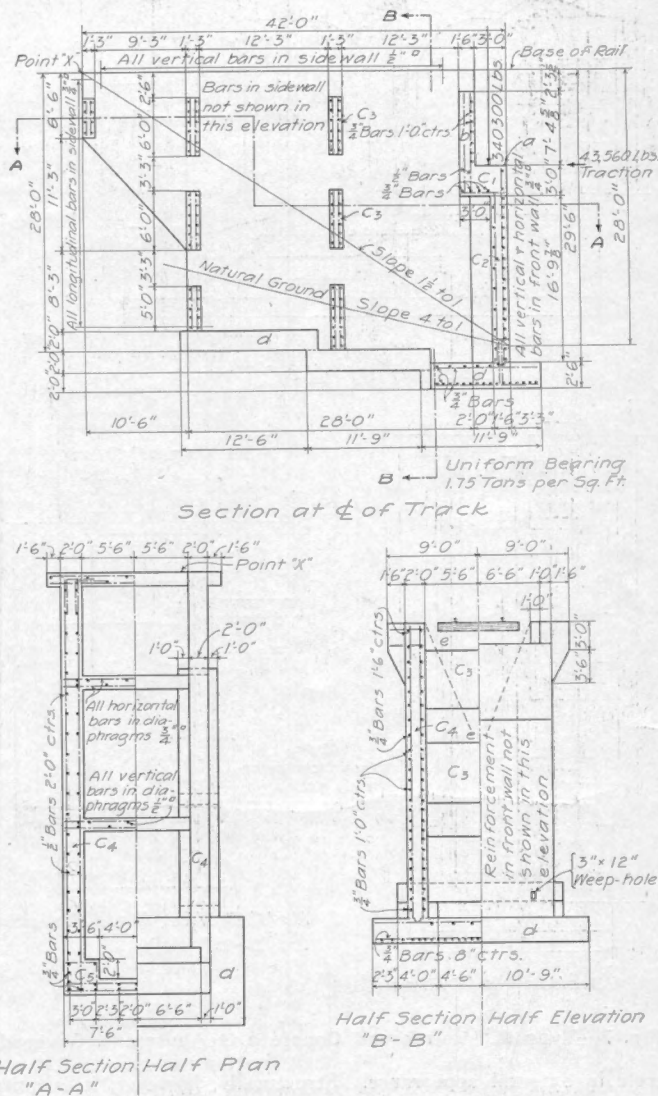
Type C_2 ; Reinforced Concrete U Abutment Filled; Long Sidewalls.
